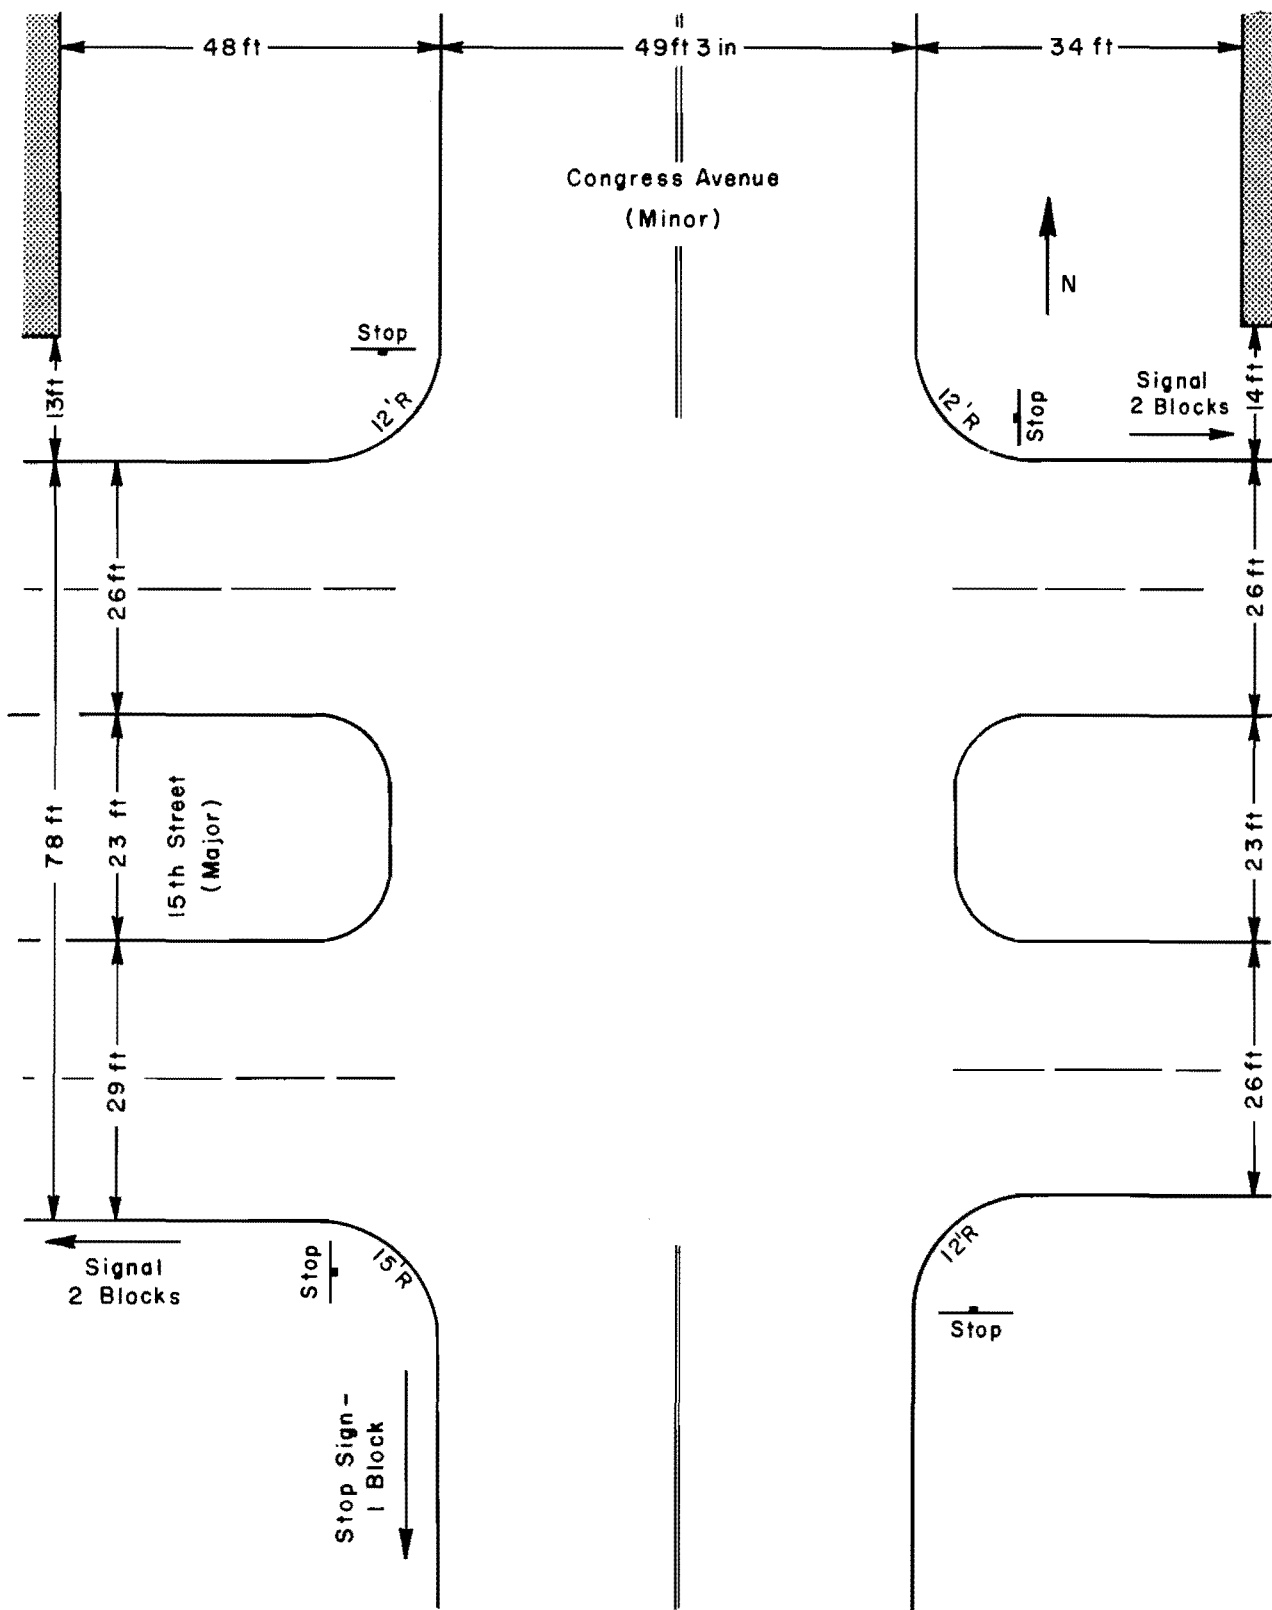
Geometric layout of 15th and Congress intersection (four-way stop).
